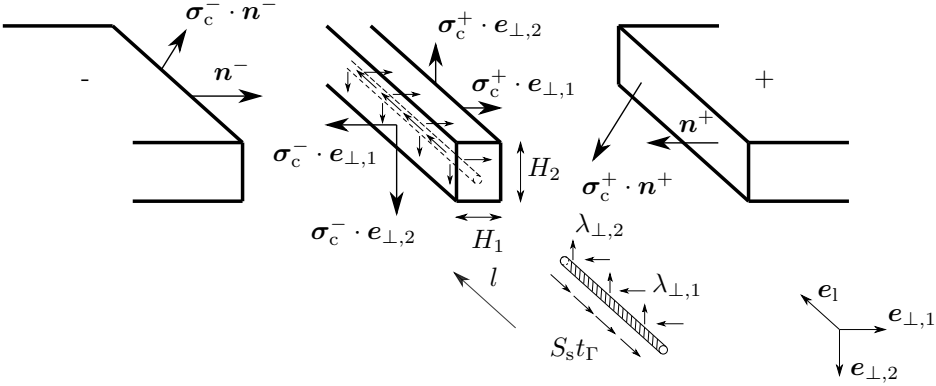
Steel–concrete interface. Boundary forces on the rebar cut out and concrete boundary tractions omitted.
